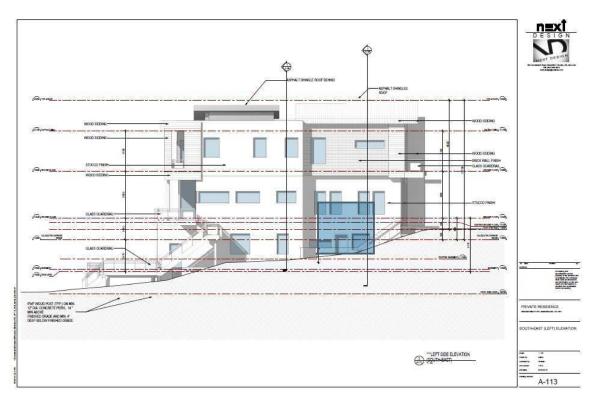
Proposed residence at 2560 Mindemoya Road, side or southeast elevation. (Image from Next Design Group, April 2018.)
